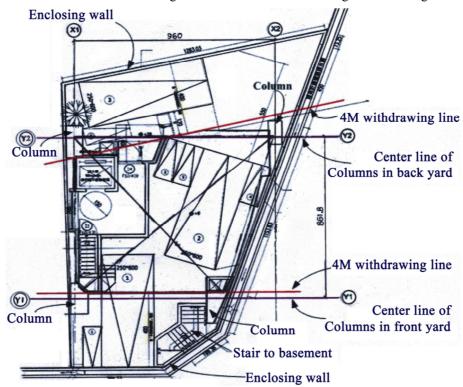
Design Plan on the First Floor of Building (Unit: cm).
